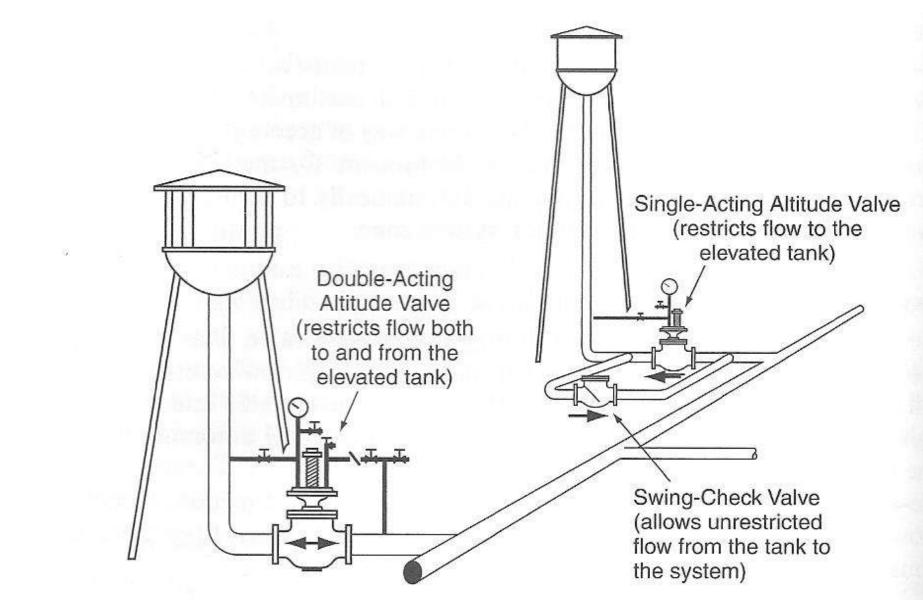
Altitude valves Courtesy of GA Industries, Inc.
